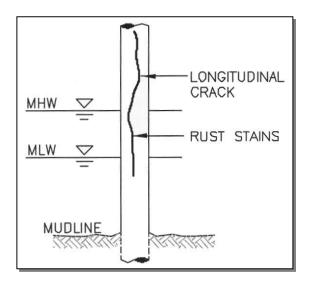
Typical Corrosion Damage to Concrete Piles
